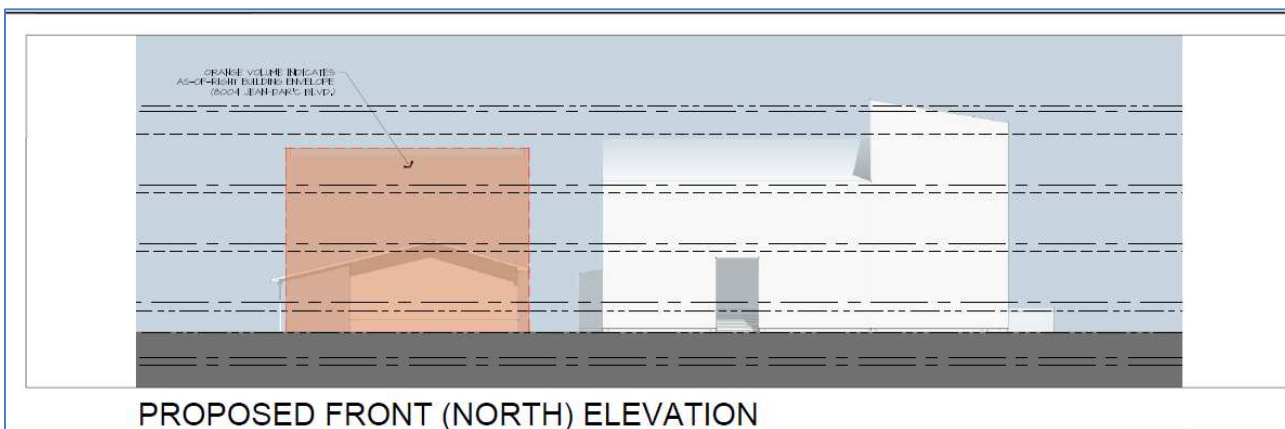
The proposed building mass compared to the neighbours as of right building mass, view from Jeanne-d'Arc Boulevard N. The maximum permitted building height of a detached dwelling in the R1N zone is 9.5 metres. The maximum permitted building height of a stacked dwelling in the R4N zone is 14.5 metres. Source: Paul A. Cooper Architect, dated December 21, 2023.
